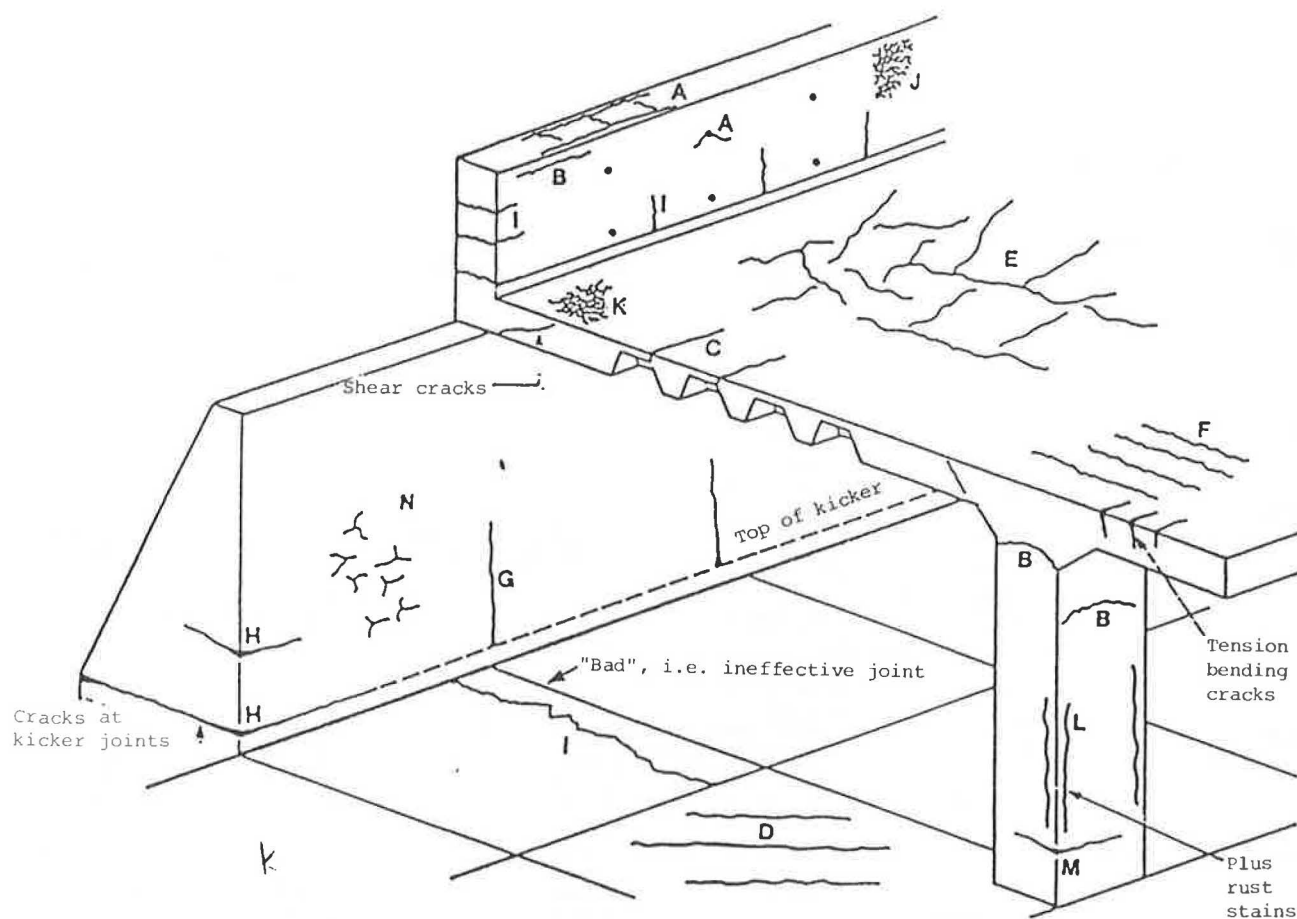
Nonstructural cracking patterns on reinforced concrete bridge (18).
